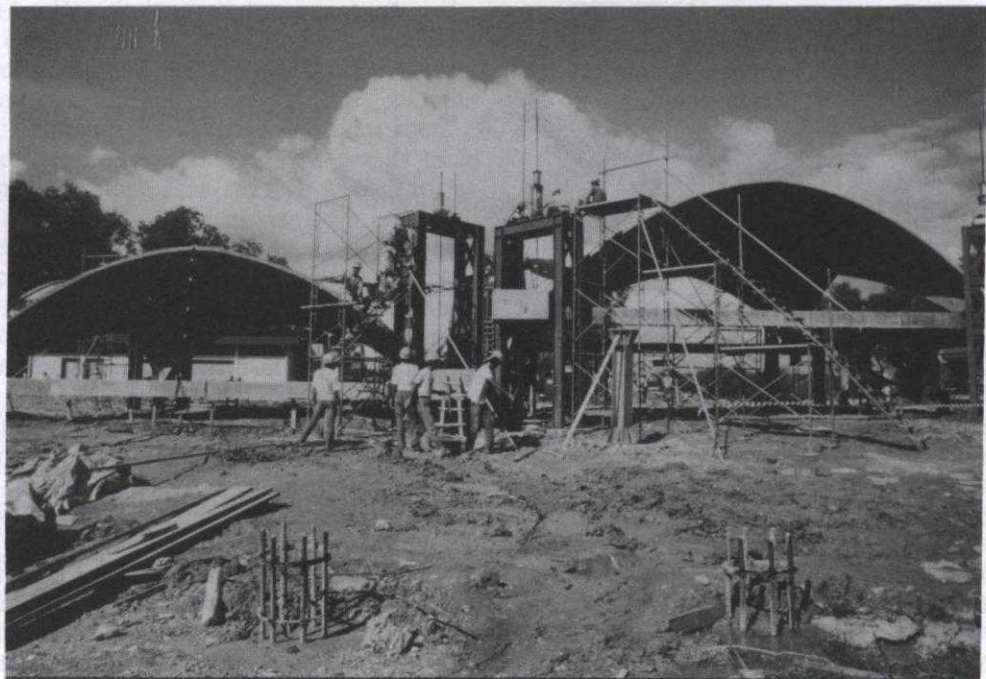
Construction of two reinforced concrete double-saddle hyperbolic paraboloid shelf roof structures.
